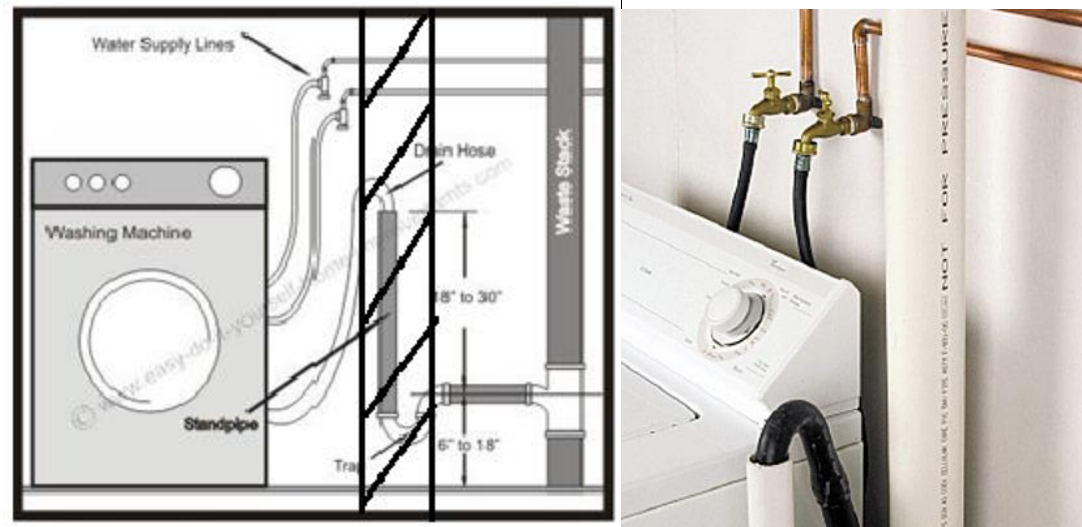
Plumbing-A Hose inbuilt in the wall for washing machine drain
